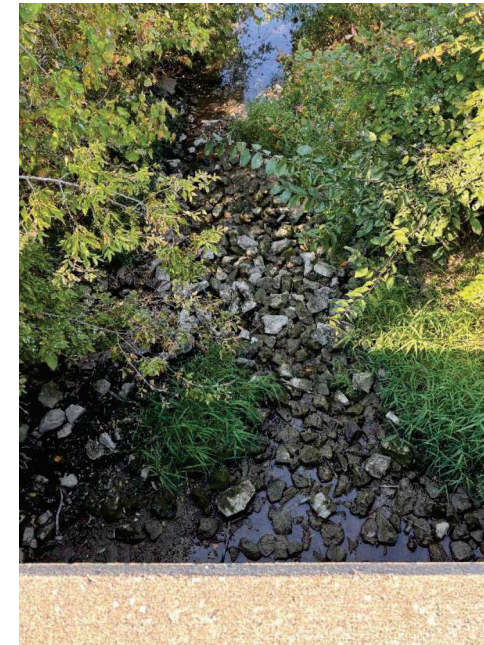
Channel of Crossing 9, north of County Road 46. Significant barrier to upstream fish movements.
